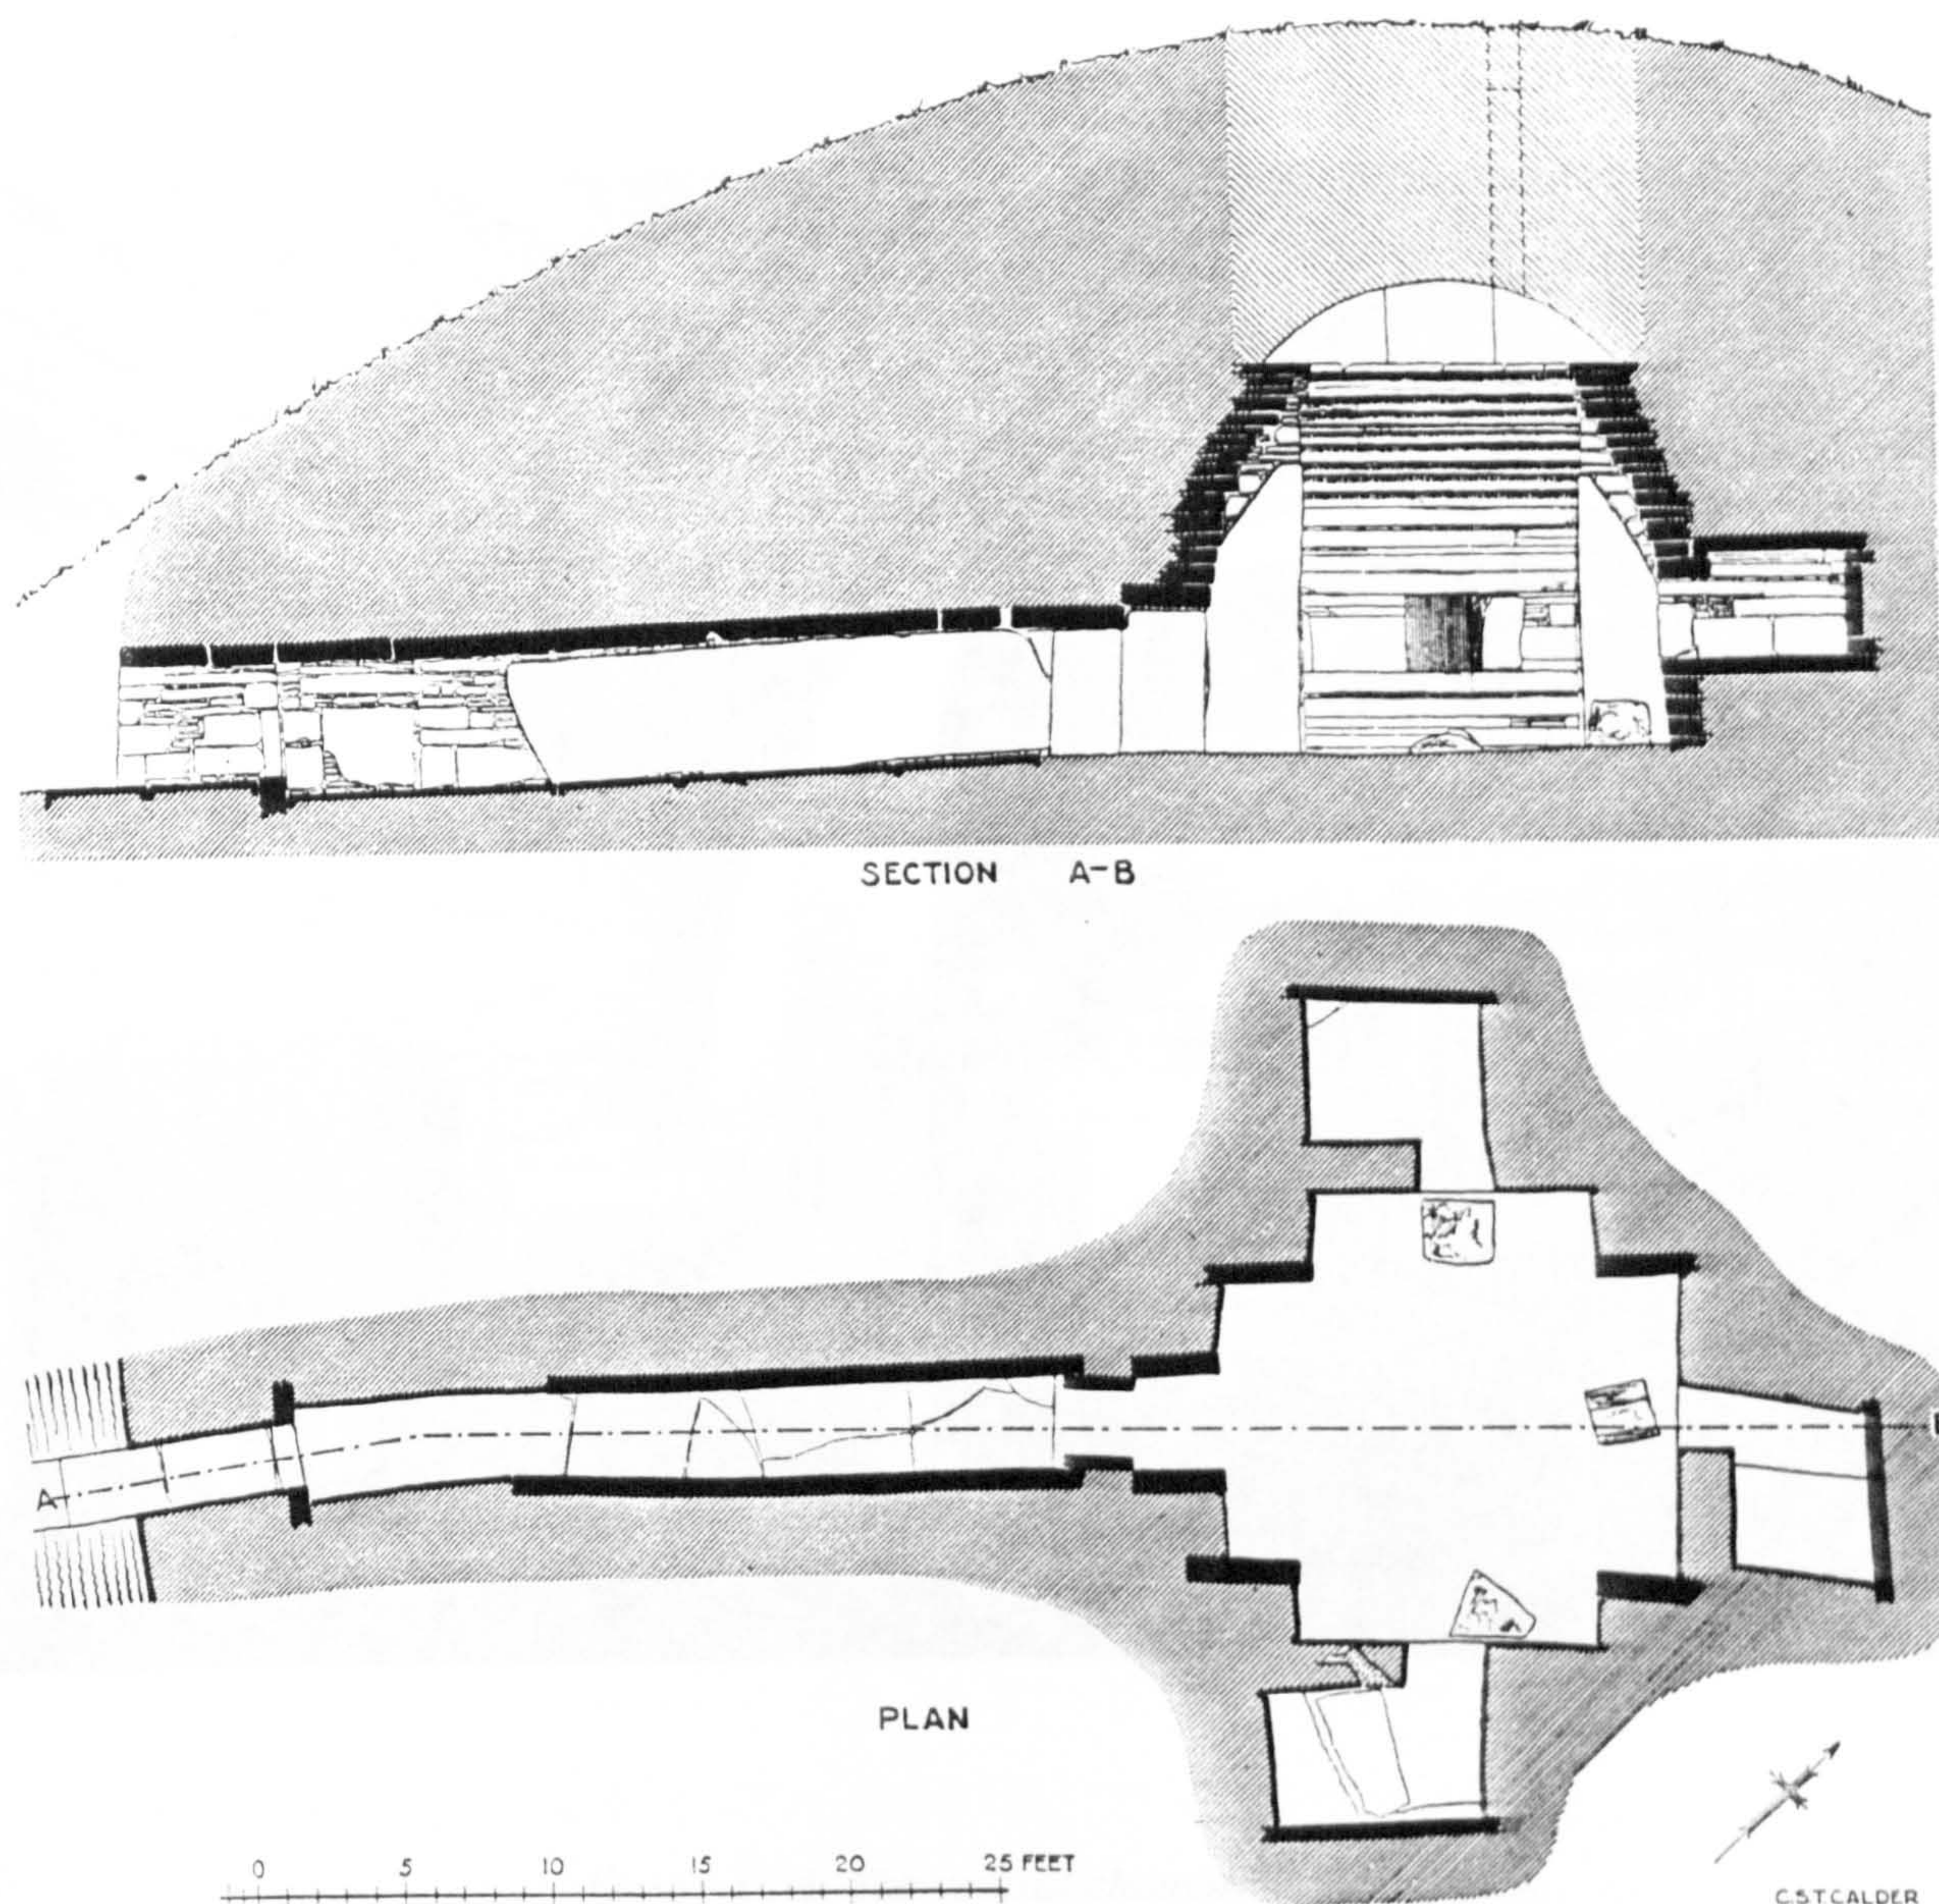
3. Detailed plan and section of Maeshowe (after Calder 1946).
